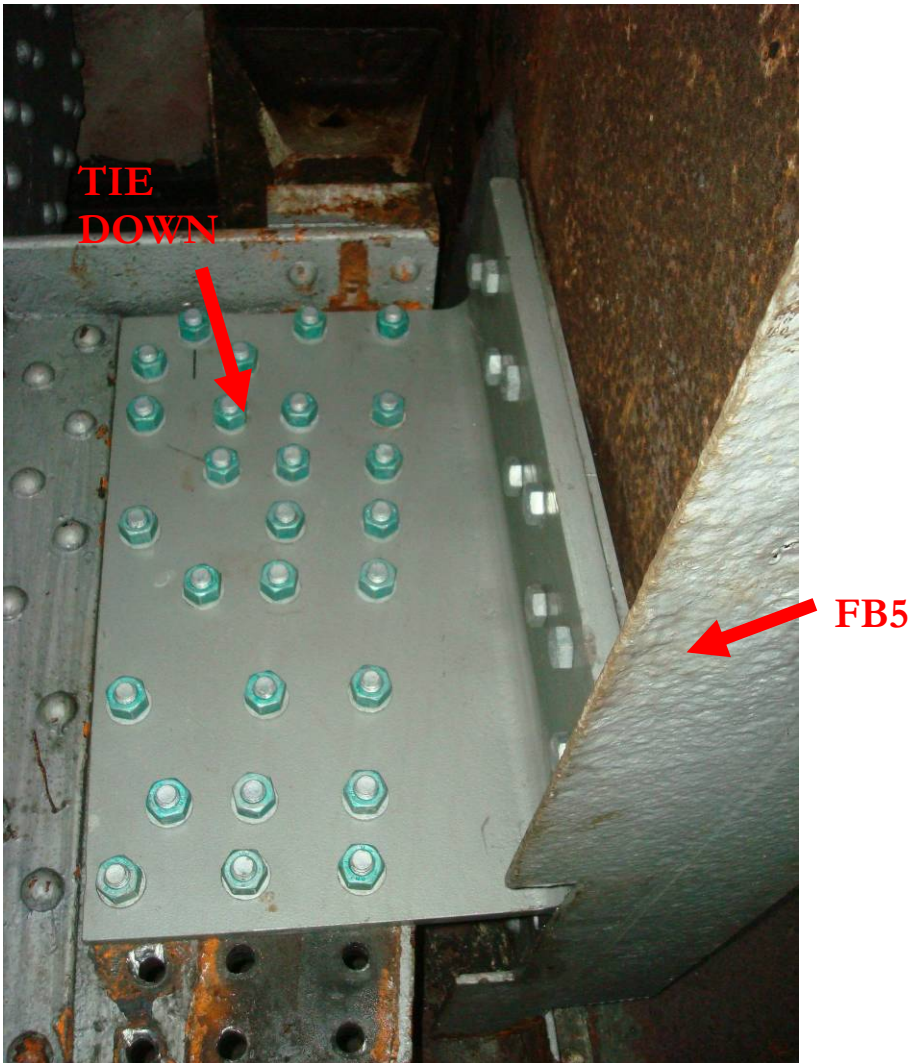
West Bascule girder and Floorbeam FB5, Temporary tie down in position and bolted to FB5 and the Bascule girder. East bascule girder similar.
